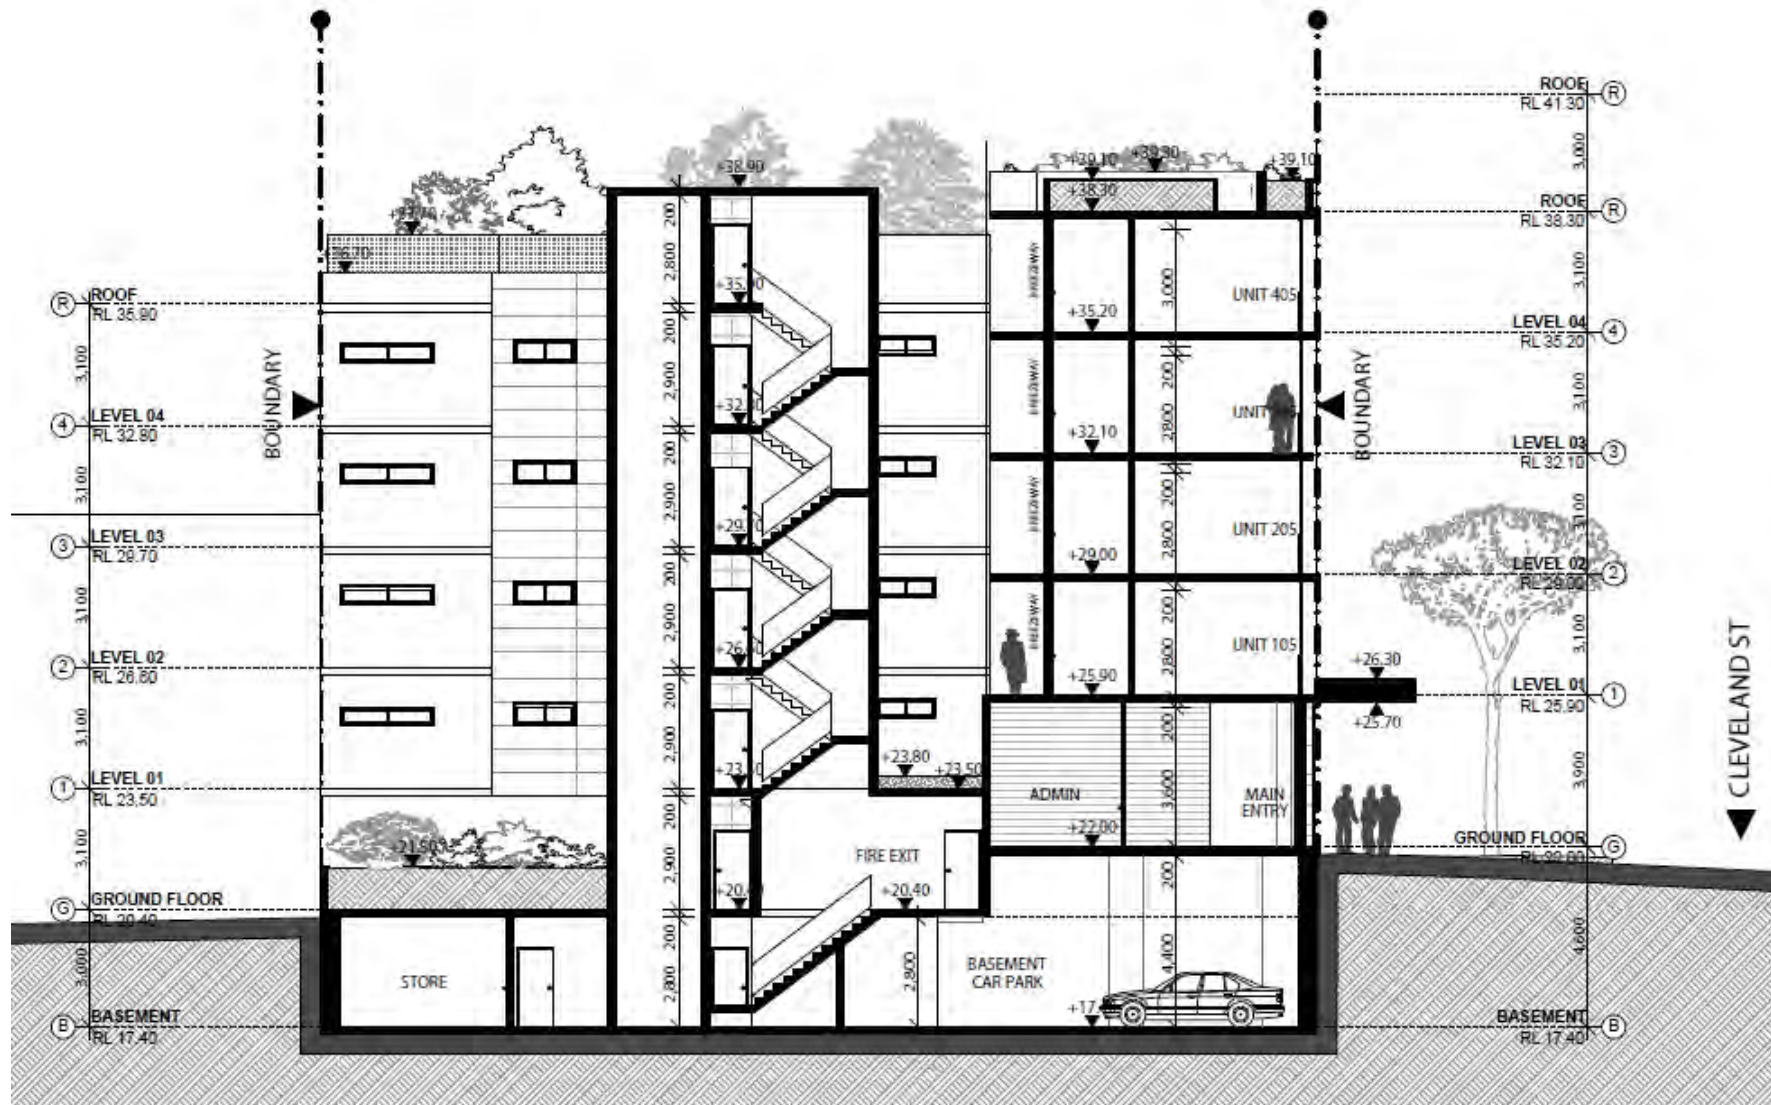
Section drawing, facing west from Woodburn Street (source: Ghazi Al Ali Architect, Drawing No. DA A1701, 08/10/2014).
